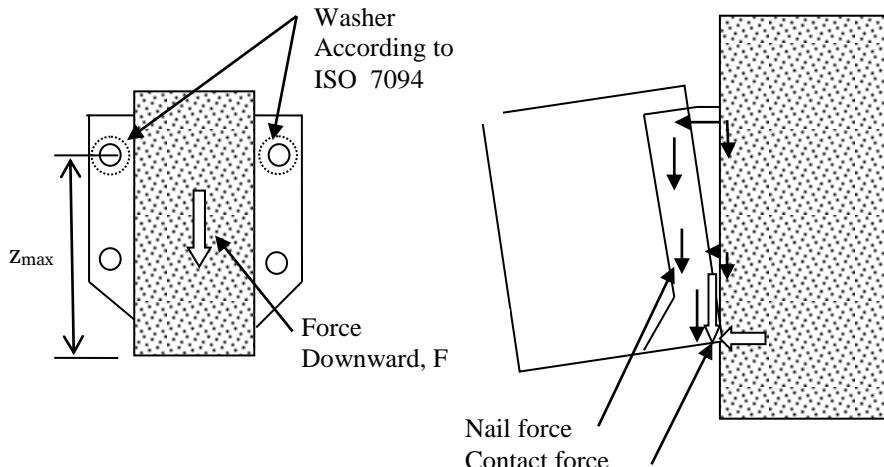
Left: Cross section in joist. Right: The joist will deflect and rotate, at the bottom a contact force will occur at the bottom plate, and the withdrawal forces in the bolts in the wall will vary linearly as assumed for nailed connections in the header.
